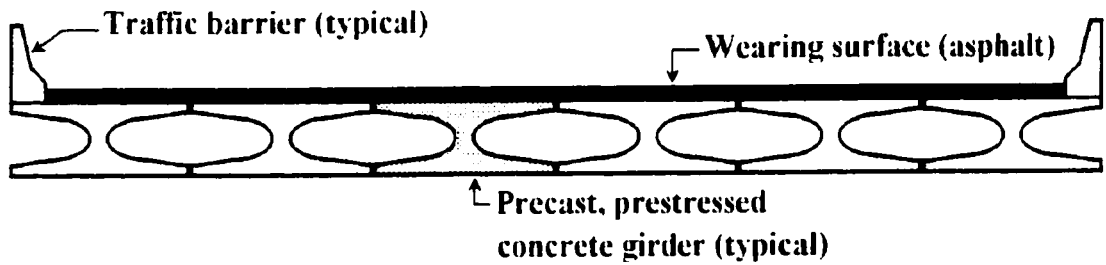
Typical Nebraska All-precaster Bridge of Butted I-Girders
